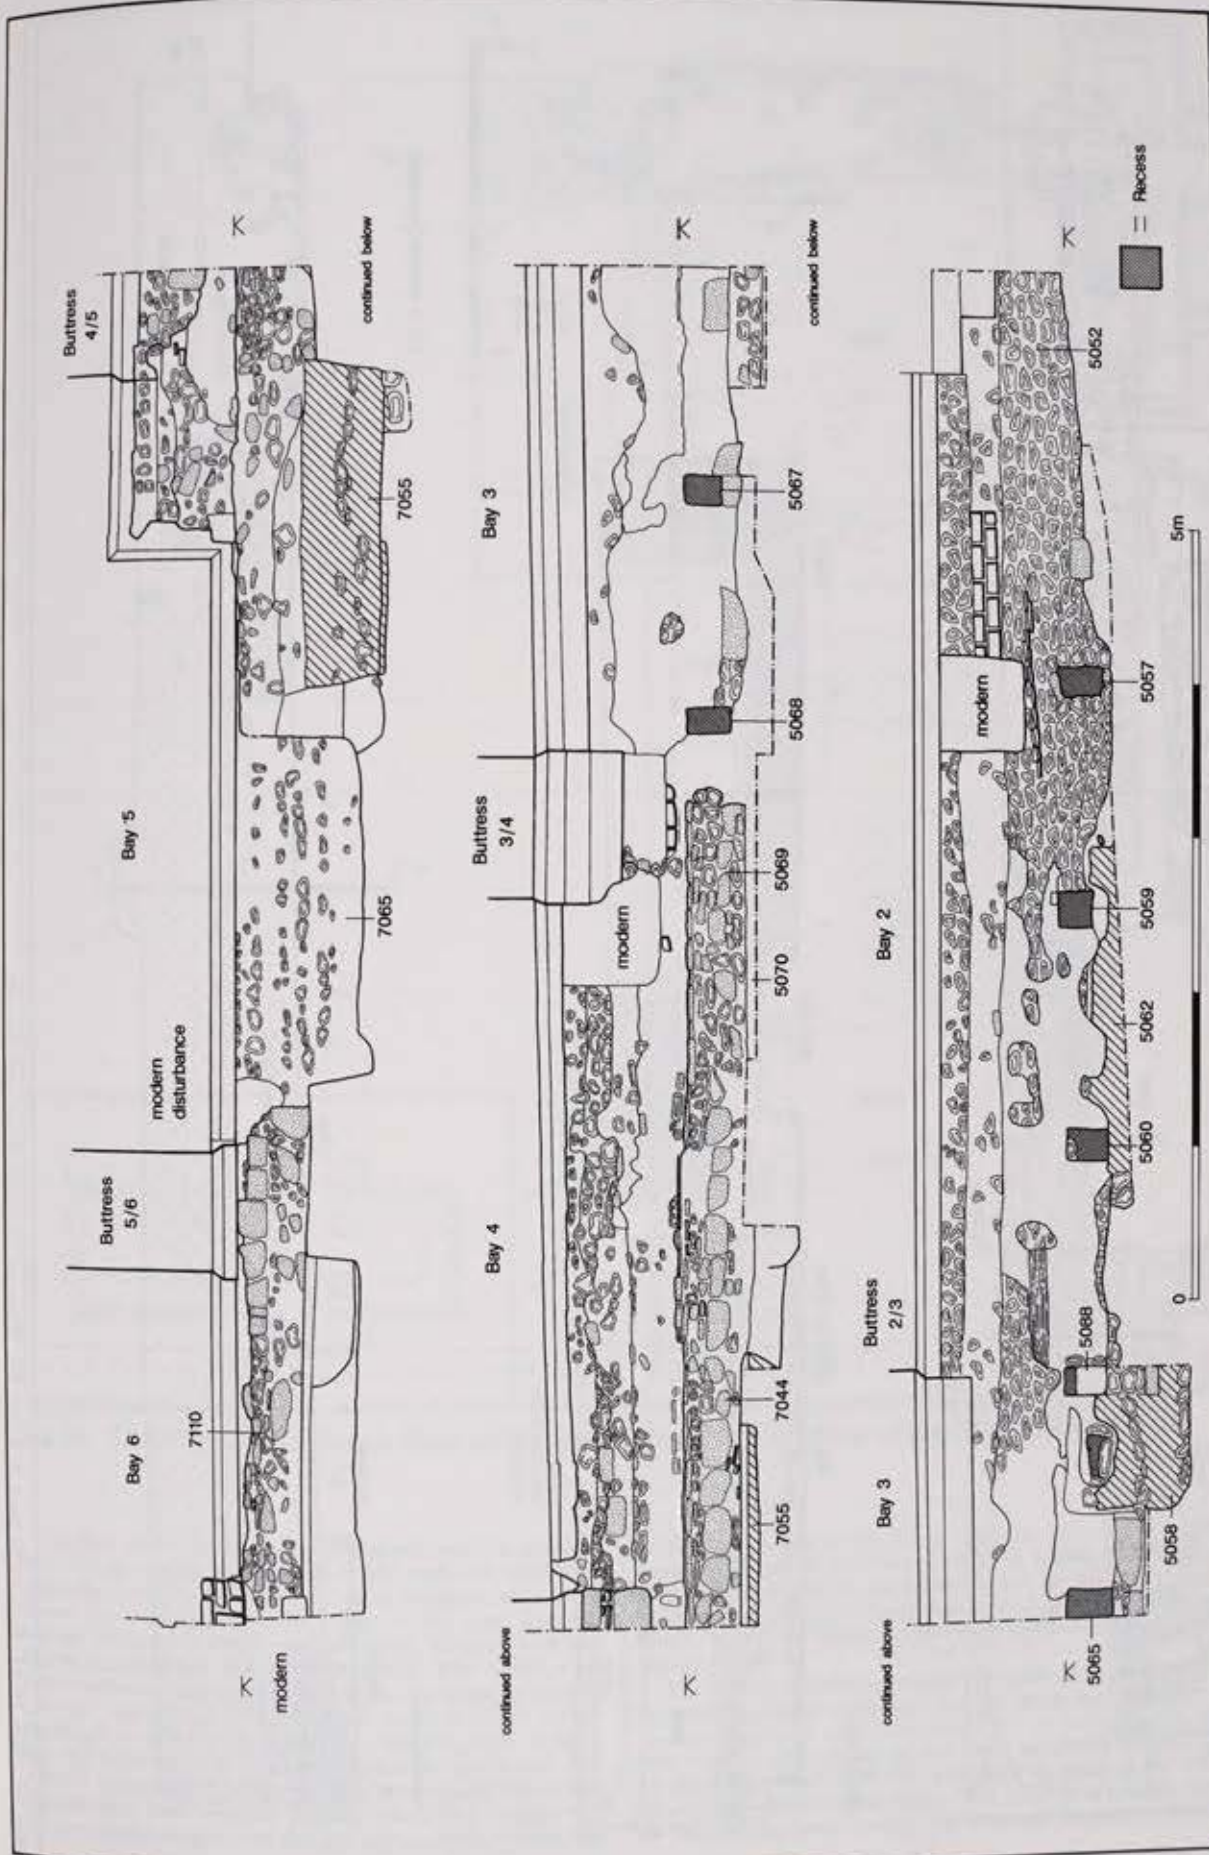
RA 1979 and A 1991.18: Elevation of footings of south nave aisle wall. See Fig 35 for plan.
